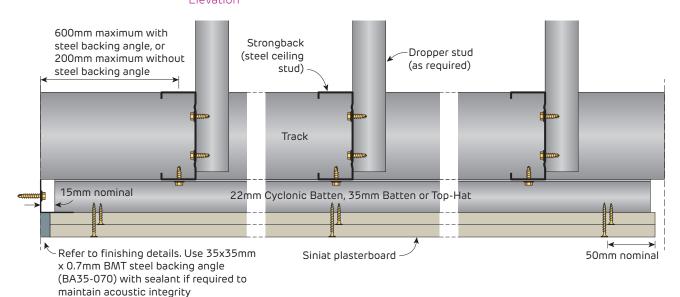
Stud Ceiling Type C2 - 2-way Plenum Braced Elevation
